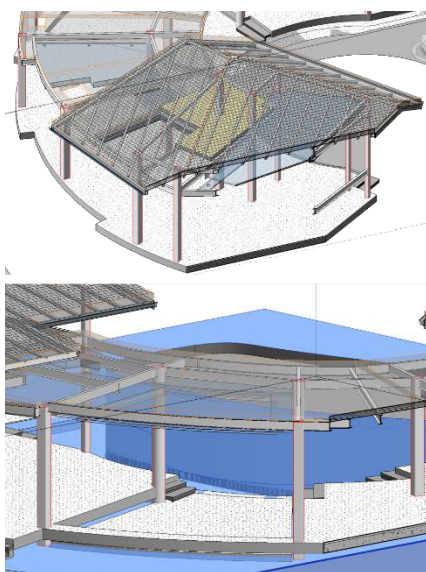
Top and bottom. A set of columns and a roof framing attached to a roof geometry. As the slope increases, columns and roof framing (beams, joists and rafters) adapt to match the roof's geometry. Model made using Autodesk Revit 2013.
